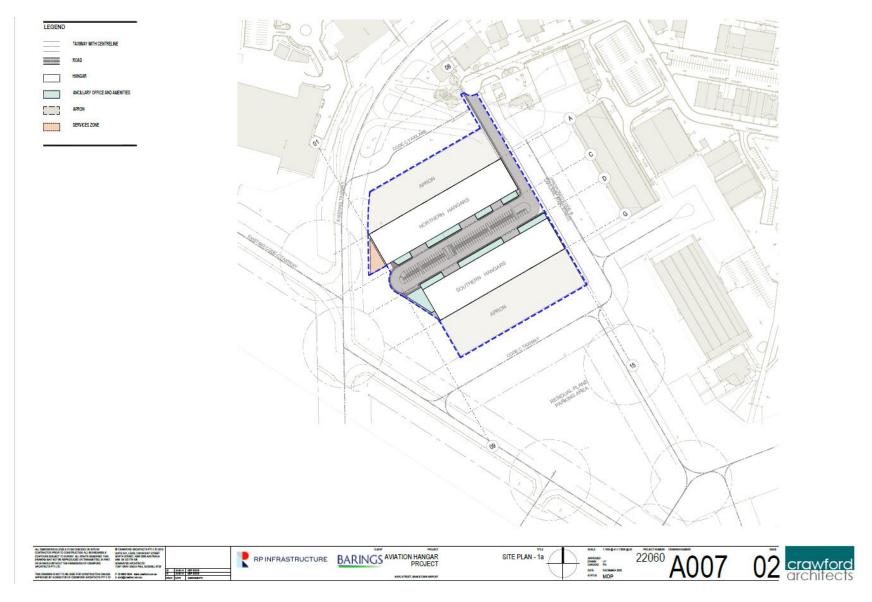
Site plan detail of the Chevron Aviation Hangar ProjectAviation Hangar Project (Source: Crawford Architects)
